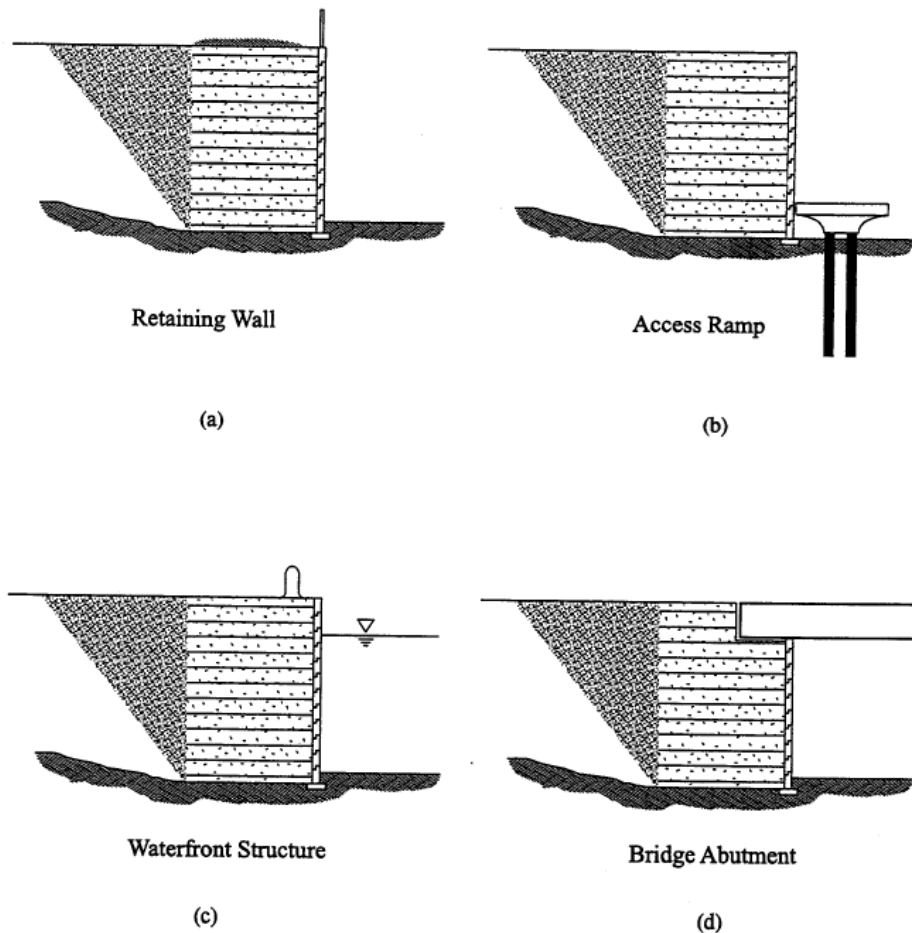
COMMON APPLICATIONS OF MSE WALLS
